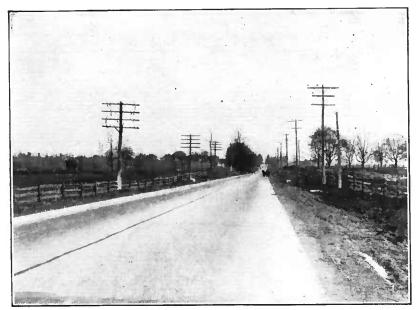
Dupont Boulevard, a road having a right-of-way of 200 feet, much of which is still used by adjoining farmers for cropping. This width prevents building encroachments and makes possible suitable landscape development.
